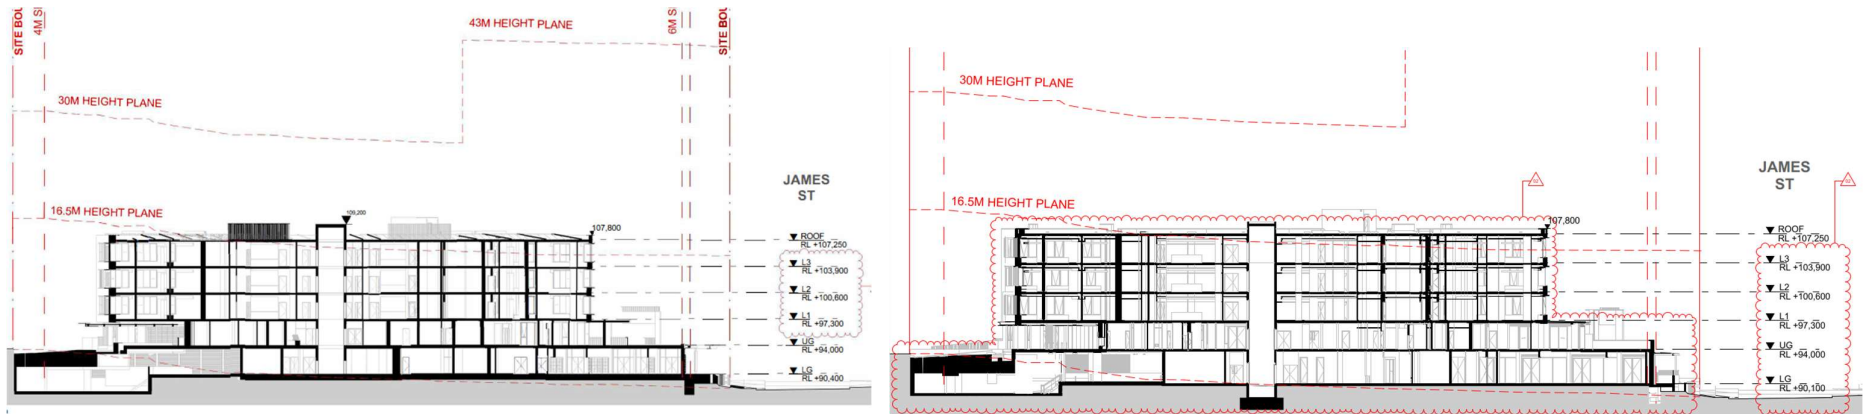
Approved and Proposed N-S Section of Building RAC/A (1 of 5)
